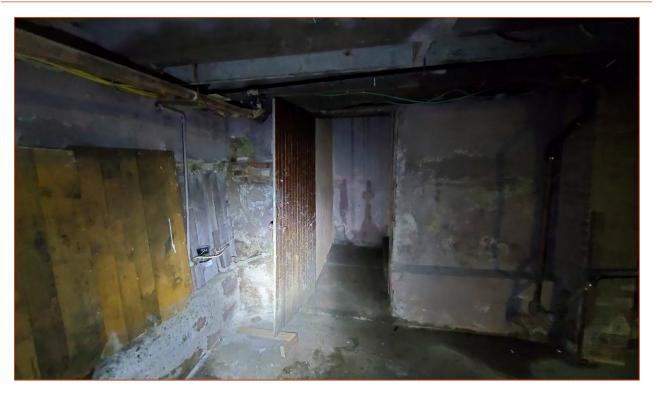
View northeast showing the stairway providing access to the eastmost entrance on the southeast elevation
